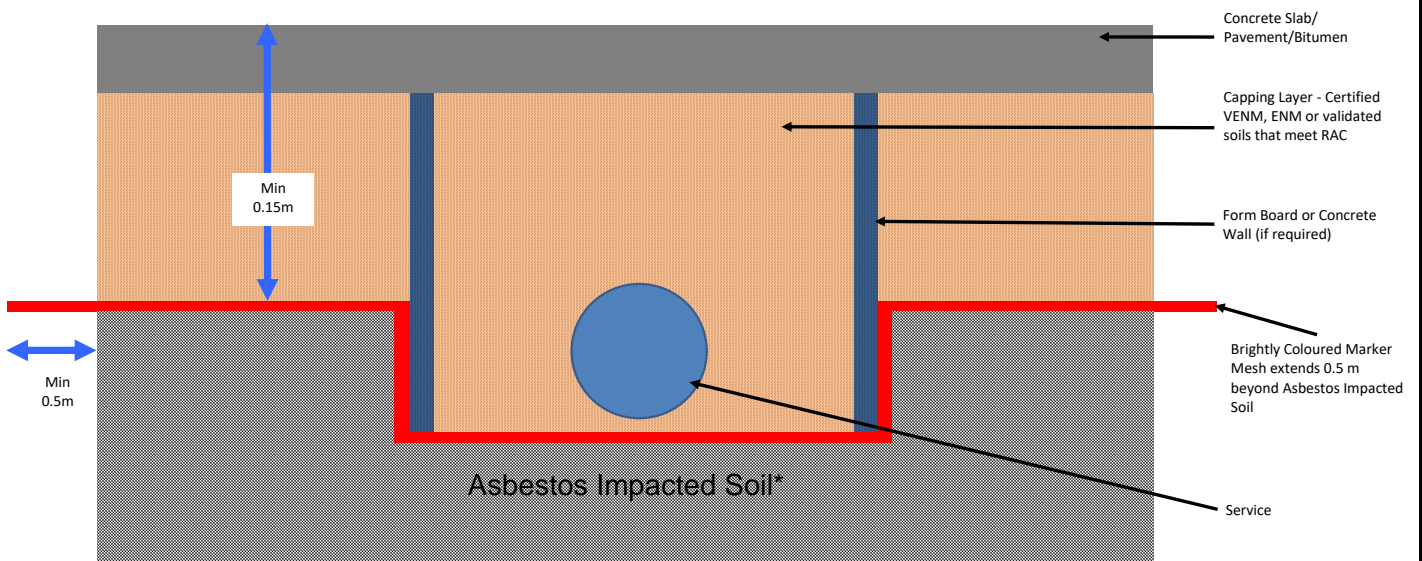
Service trench greater than 0.15 m beneath concrete hardstand/pavement areas
